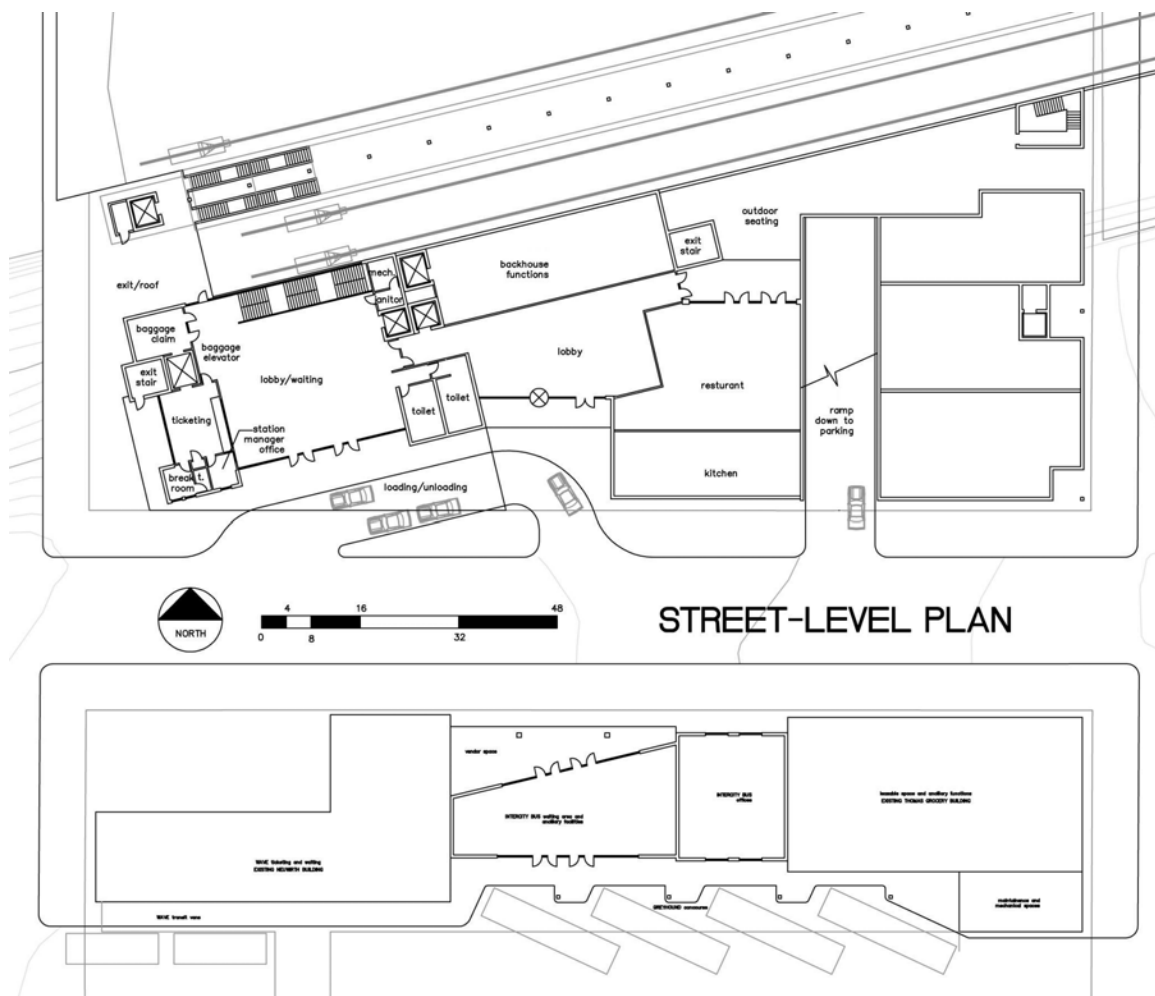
Figure A8: Campbell Street Entry Level Plan. Plan is oriented parallel to the train tracks to simplify passenger movement between platform and rail cars and to provide space for a drop-off zone at the front of the building. Elevator and stairs in lobby take passengers to the rail platform below.
